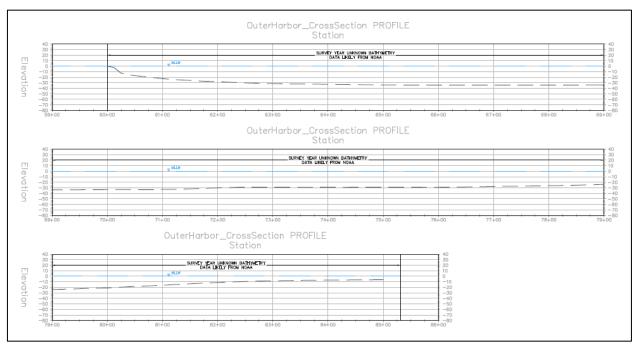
Outer Harbor Cross Sections of the Existing Grade
